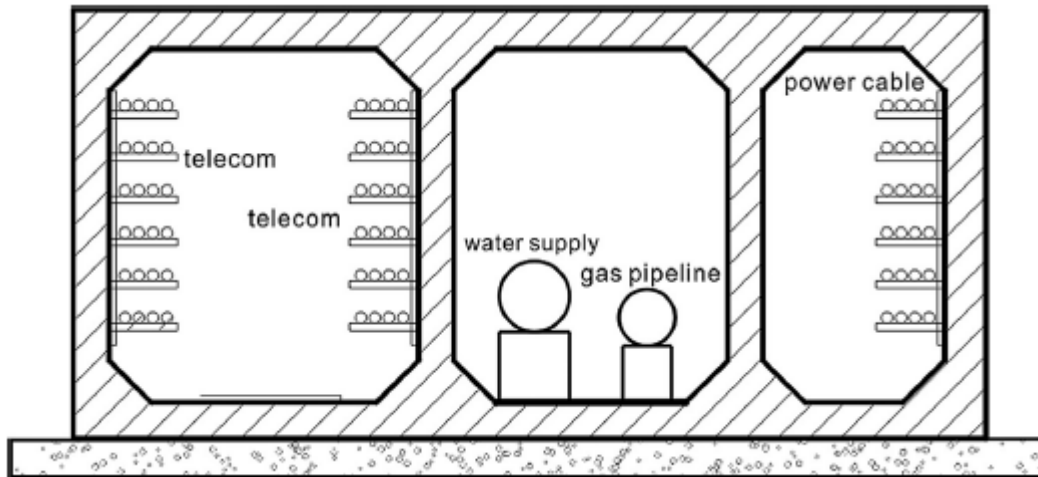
General layout of a trunk utility tunnel (Wang, T, 2020)
